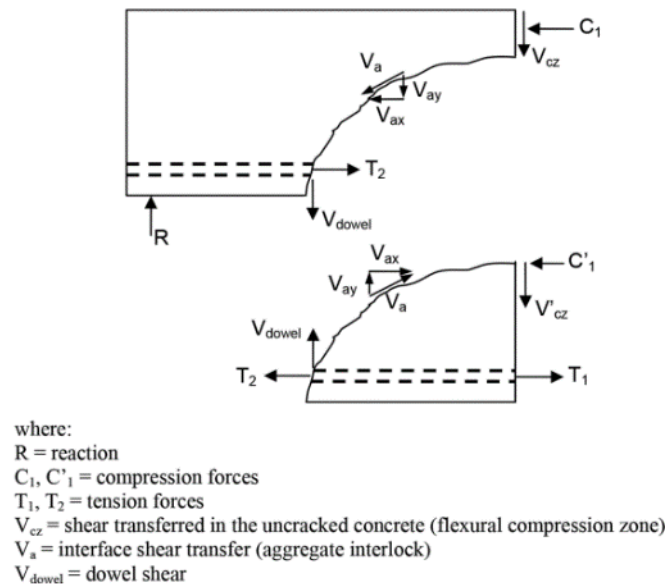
Forces in beam with no stirrups ( cracked ) [5].
